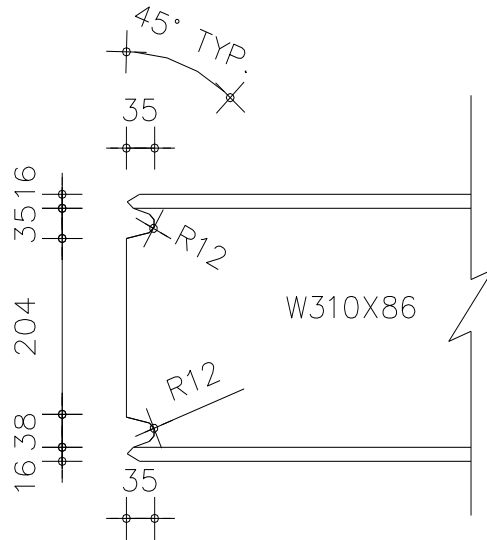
Weld access holes dimension at the welding side of the wide flange beams.
